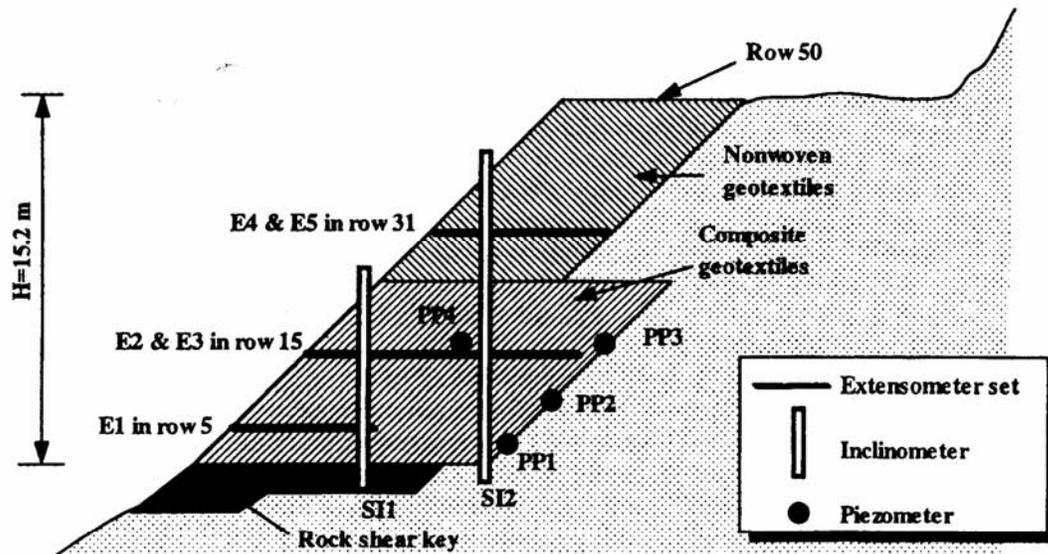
Cross section of the reinforced slope showing the instrumentation layout
